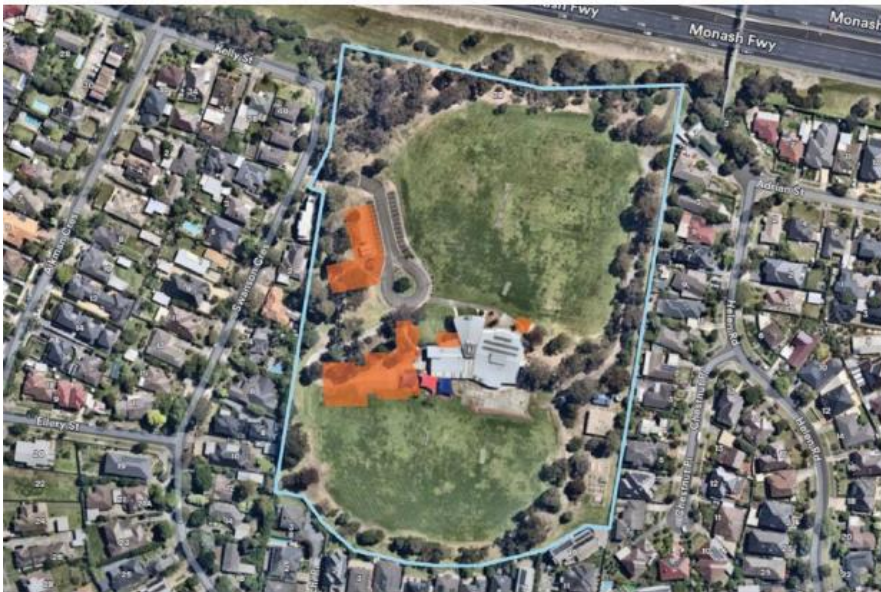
subject site overlaid with the location of the proposed buildings and works in orange.
